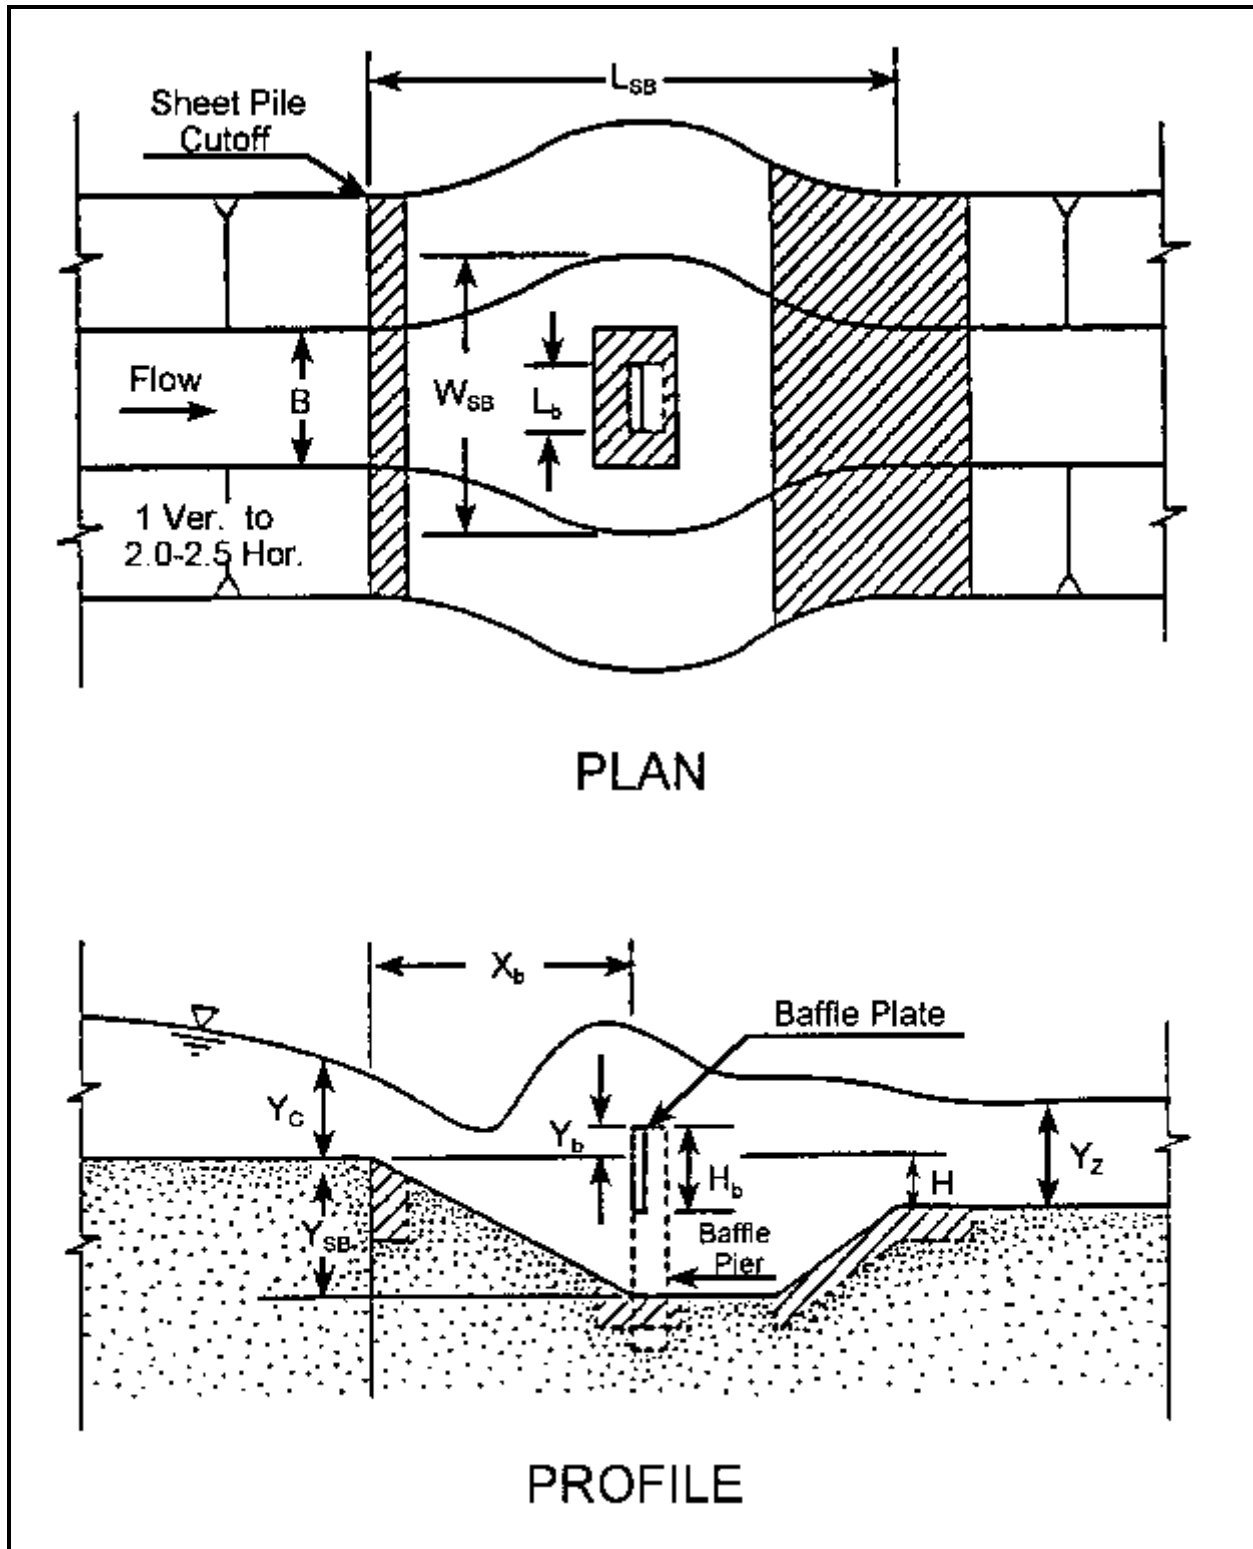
ARS-Type Grade Control Structure with Pre-formed Riprap Lined Stilling Basin and Baffle Plate (adapted from Little and Murphey, 1982)
